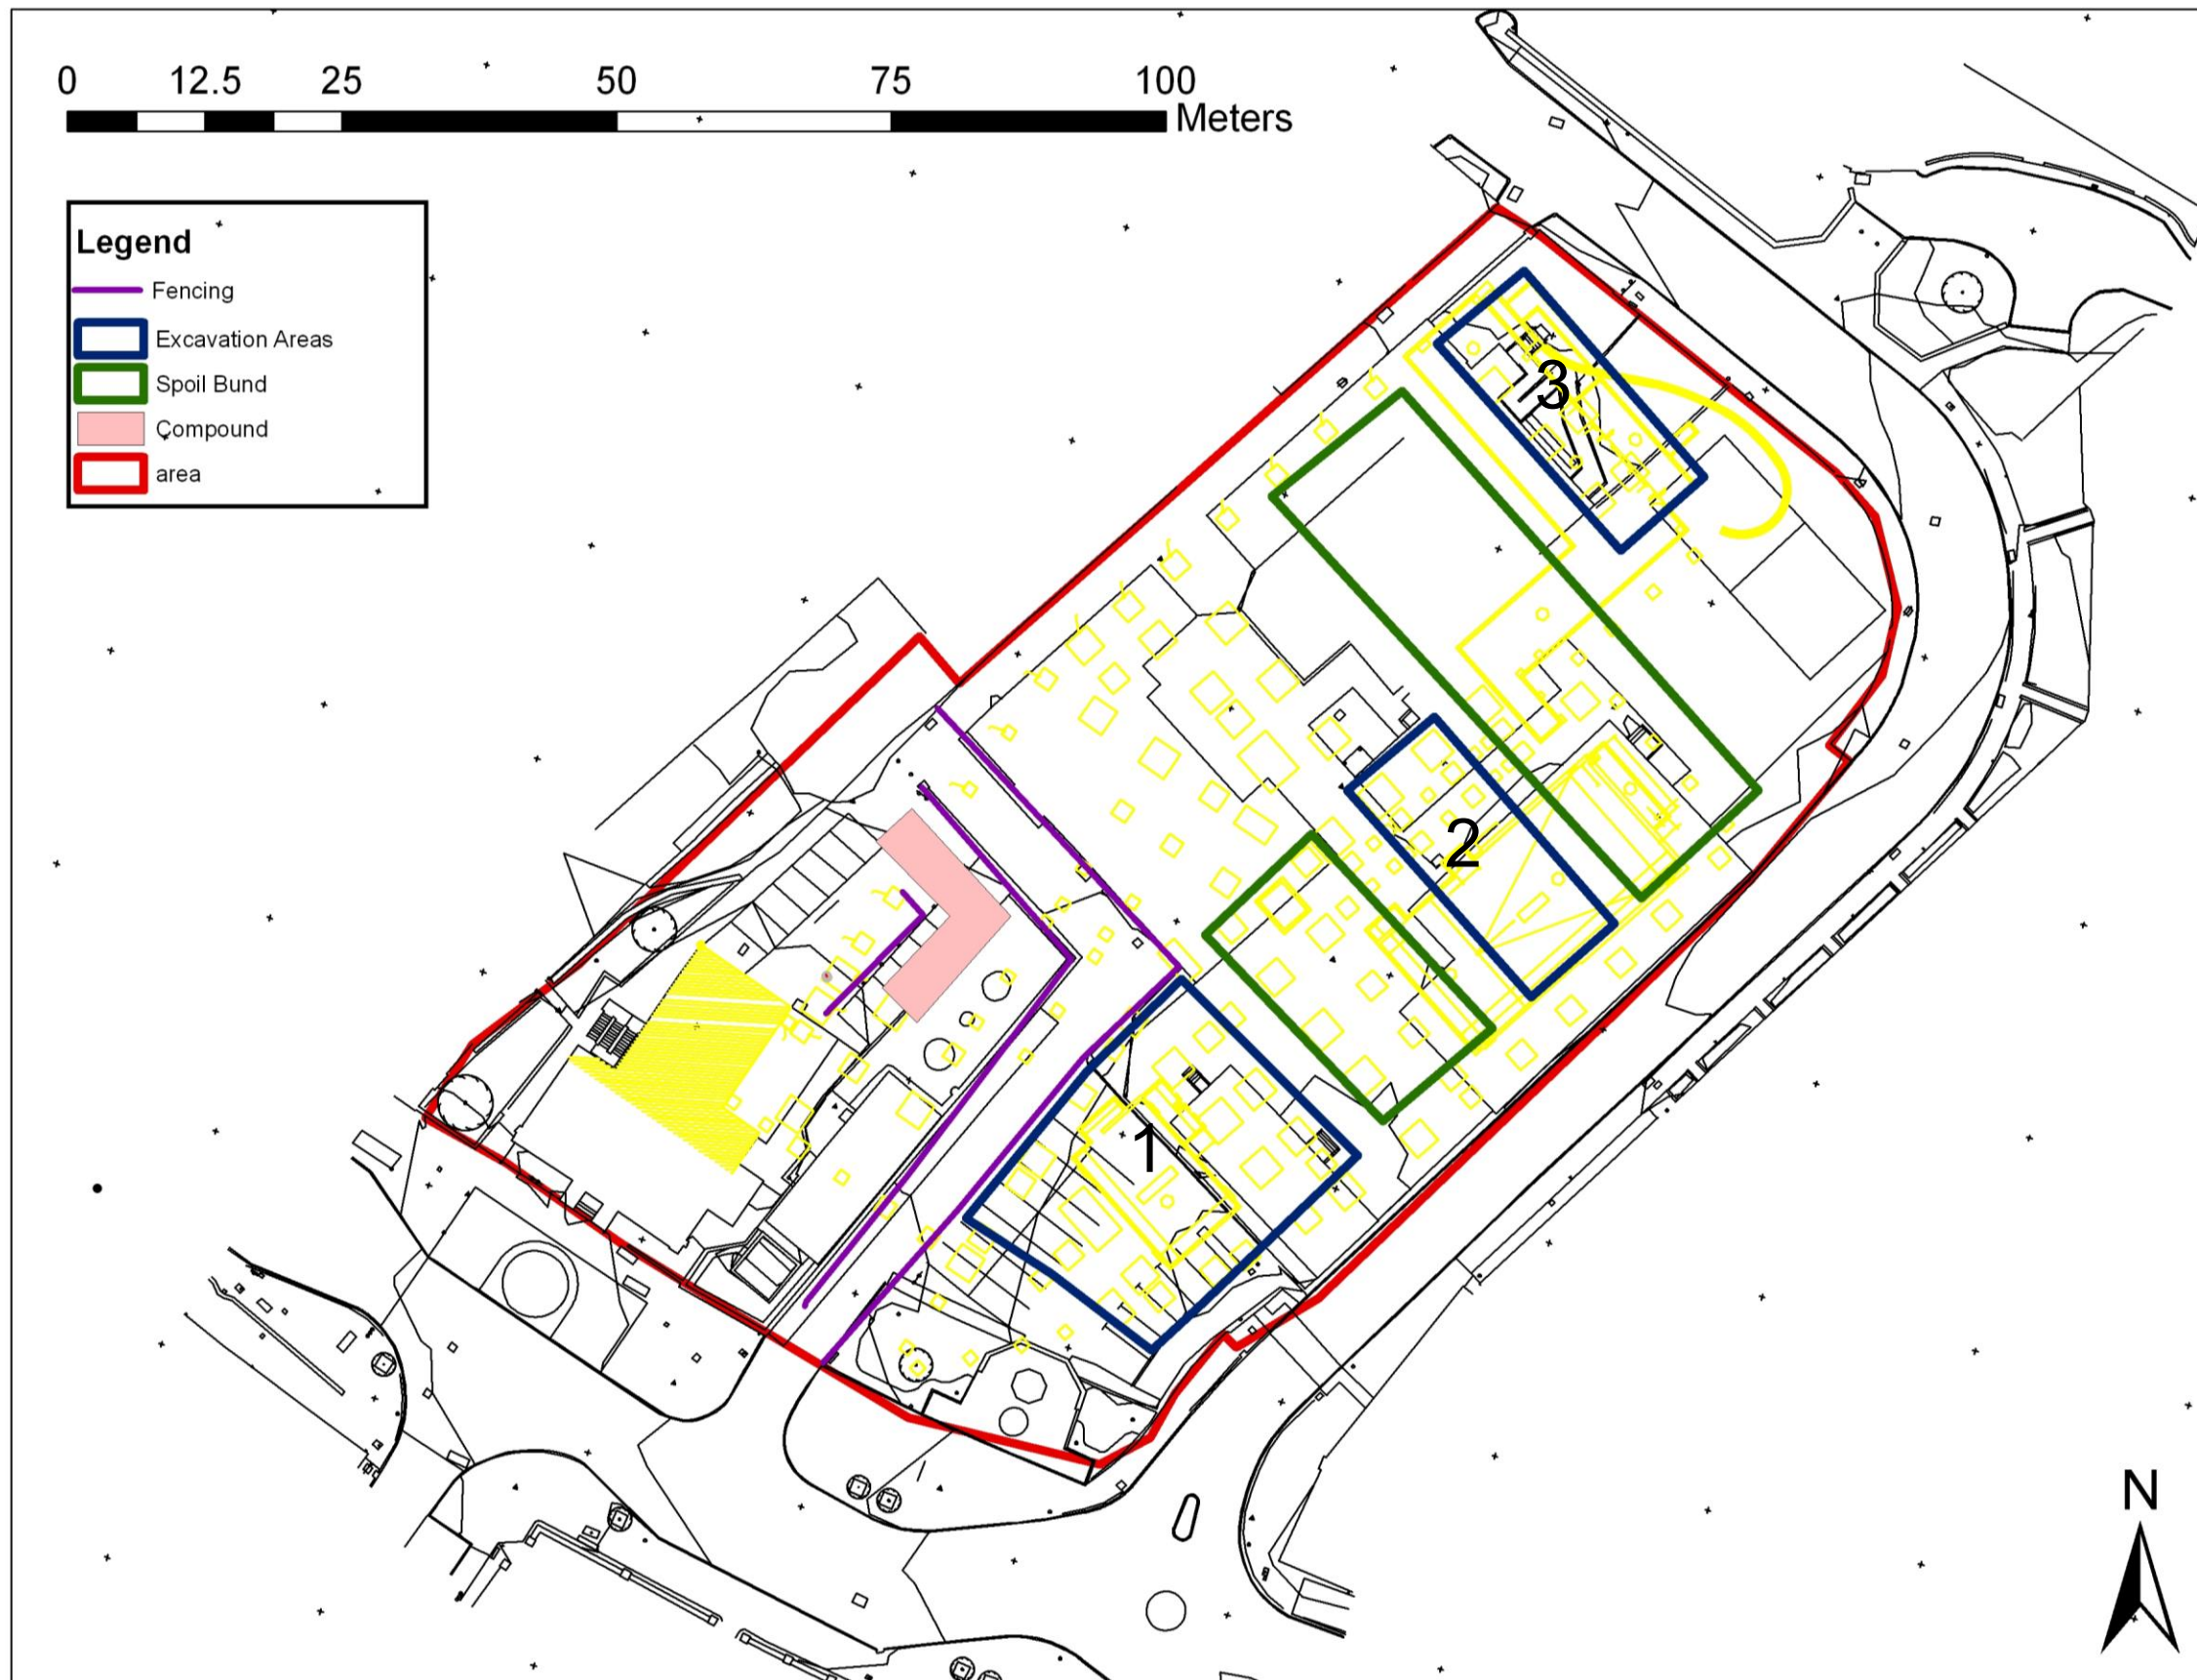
Excavation layouts overlain over forthcoming build in Yellow – marked are pile caps and subterranean structures.
